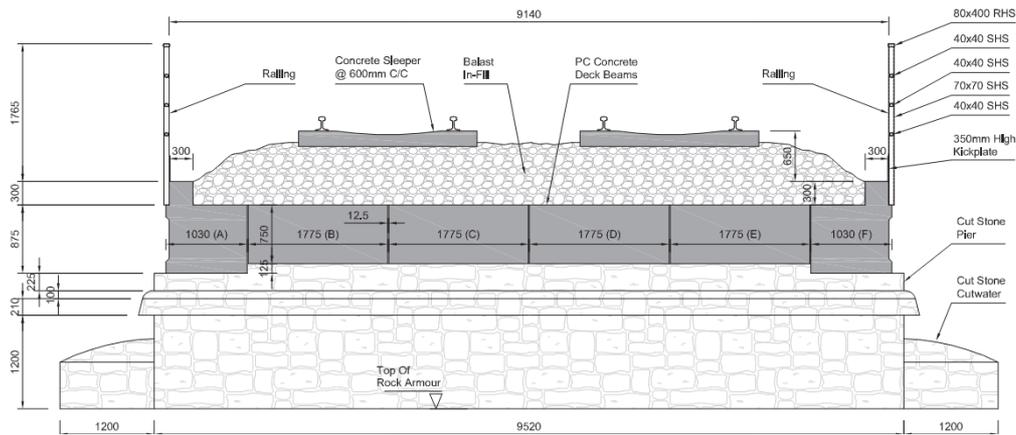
UBB30 Typical section for spans 1 and 12 (end spans)
